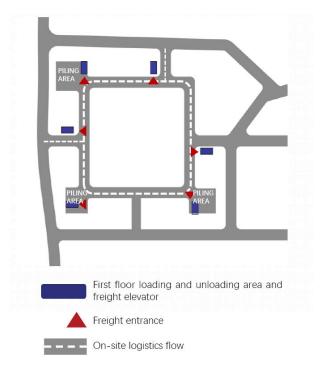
First floor logistics flow line and loading and unloading area (source: the author)
